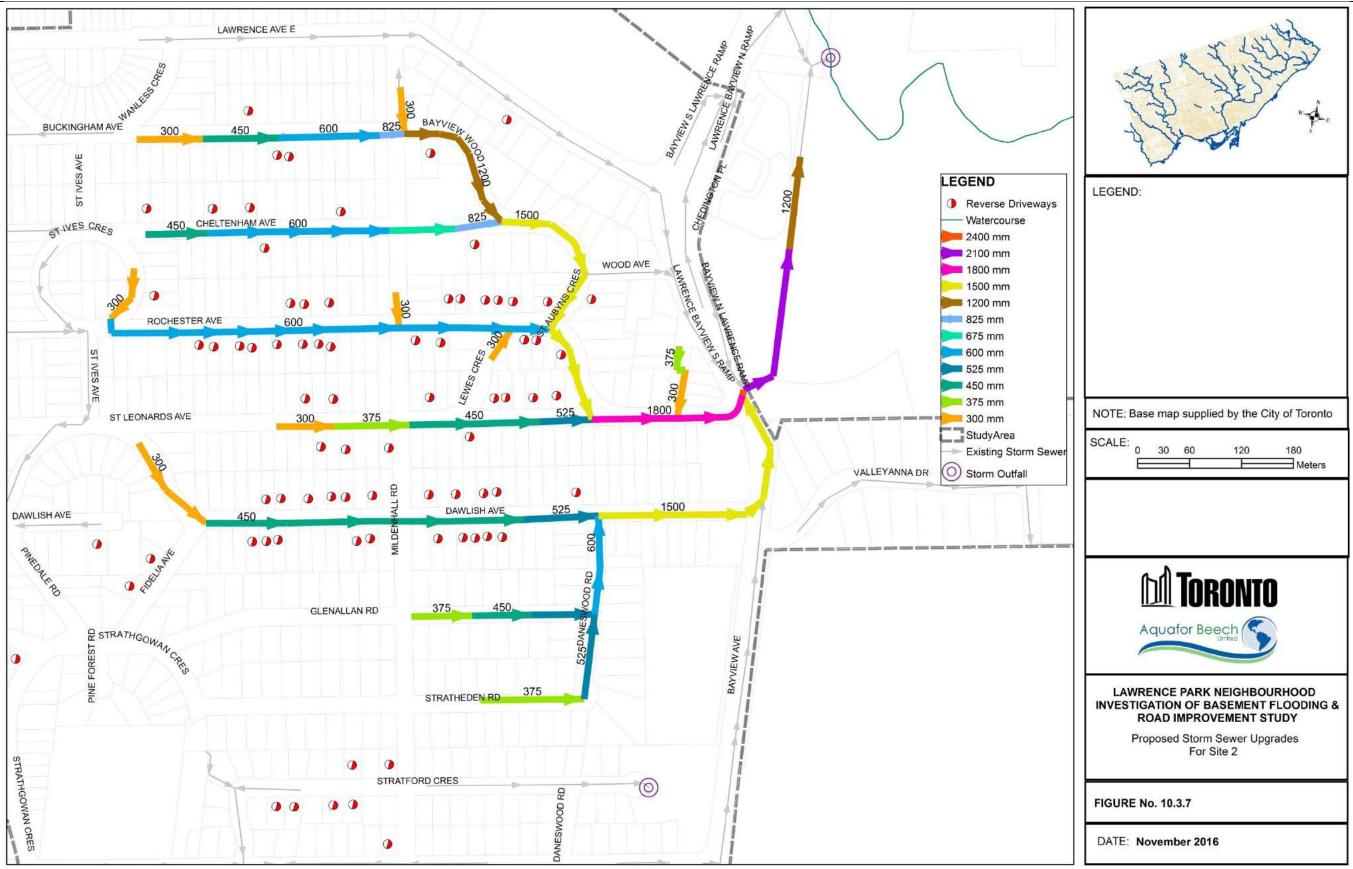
Proposed Storm Sewer Upgrades for Site 2
